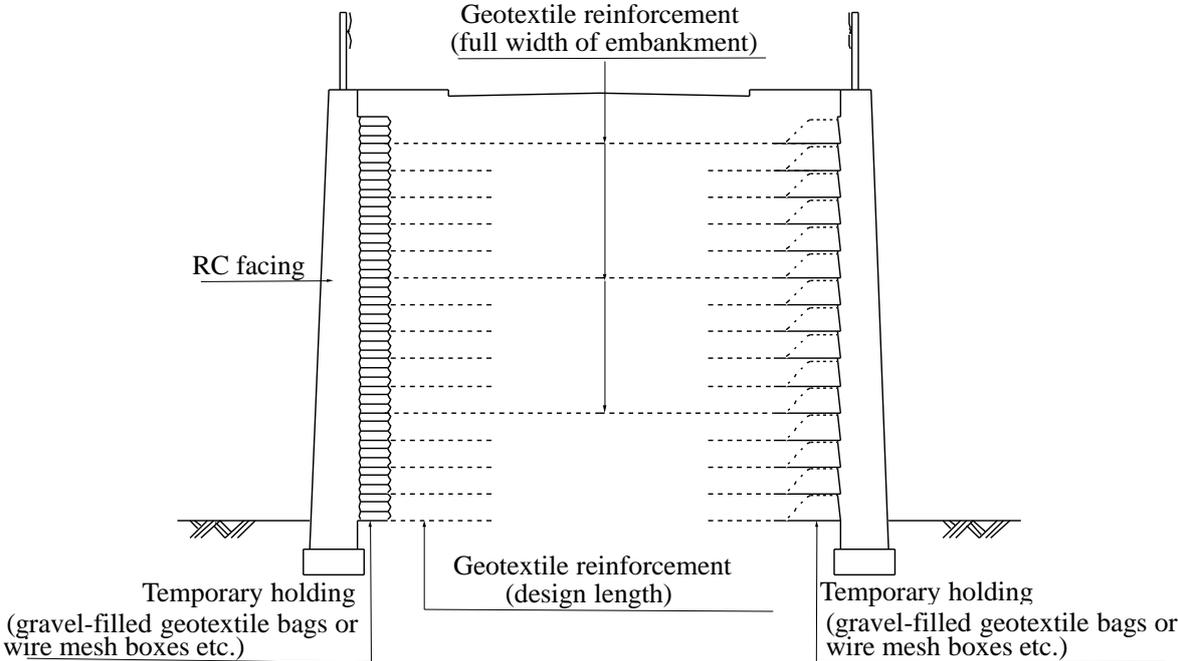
(a) Standard drawing of RRR-B structure with double-sided reinforced soil retaining walls
